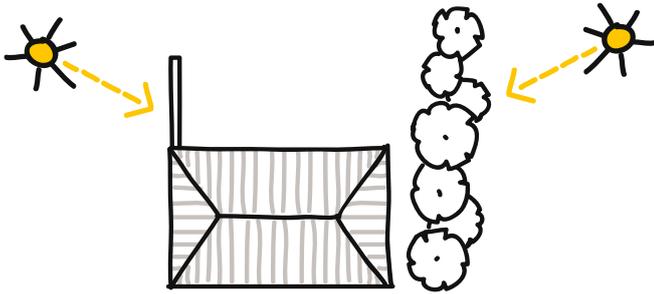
Forward shading using a blade wall (left) and mixed canopy (right).
